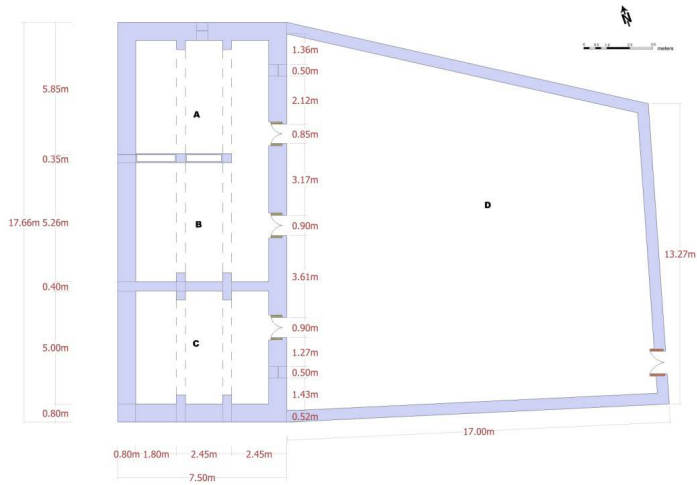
A top plan model of floor on Quntarah type (Samad)
